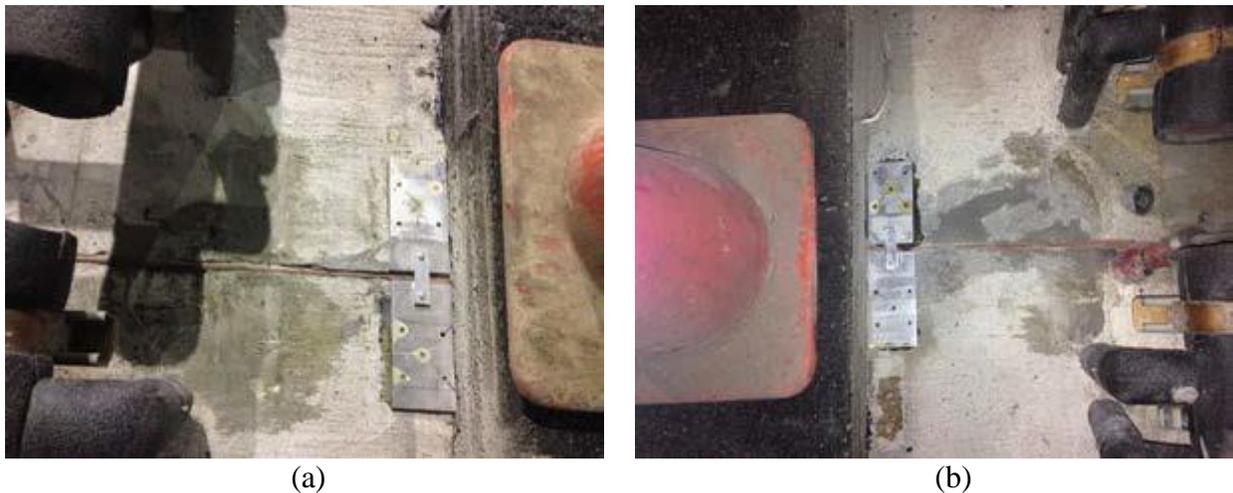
Joint Displacement Gauge (JDG) Mounting Plates.
